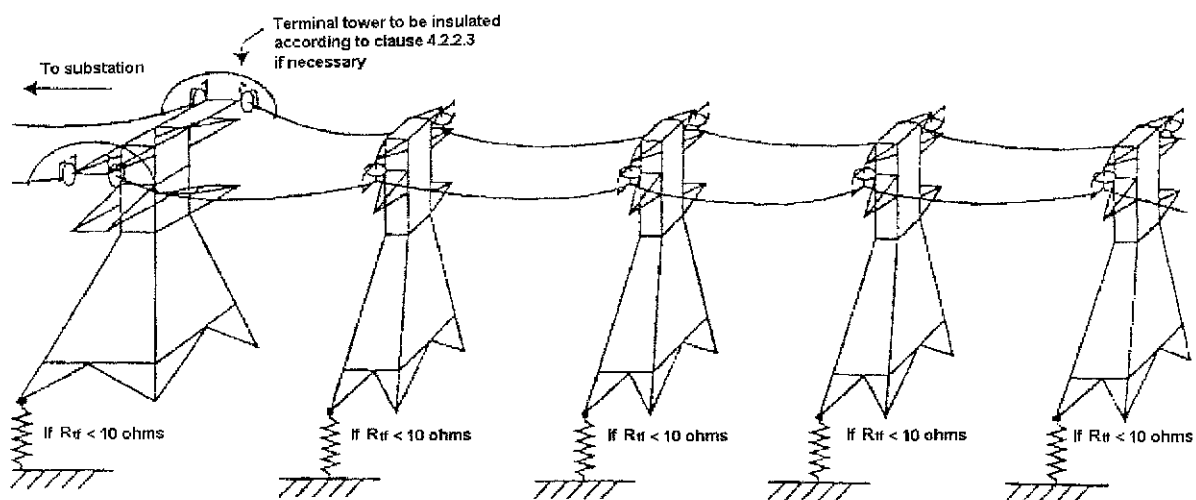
Insulation of earth conductors on first five towers out from substation, with footing resistance less than 10 Ω
